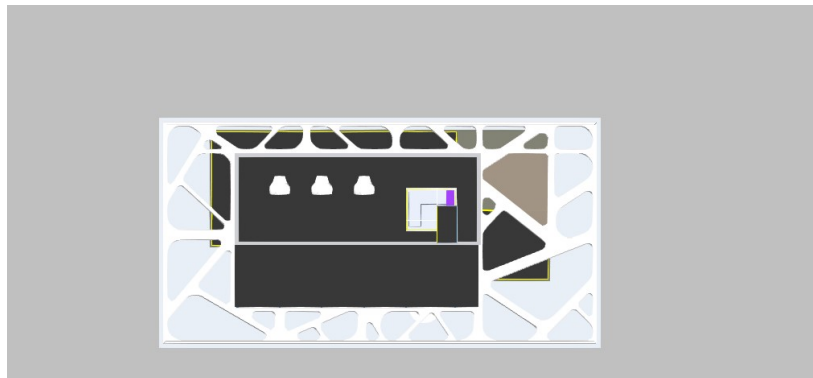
Extracted building envelope of the BIMcollab_ARC model
